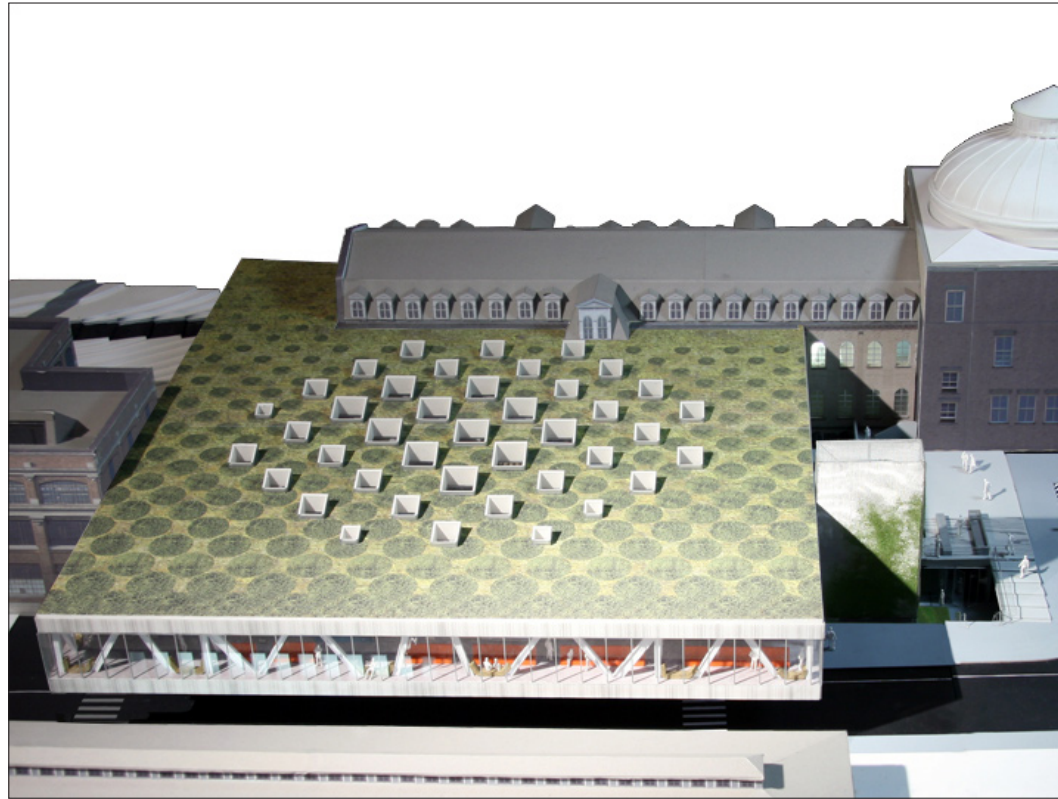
Model view of Milstein Hall's green roof, looking south.
